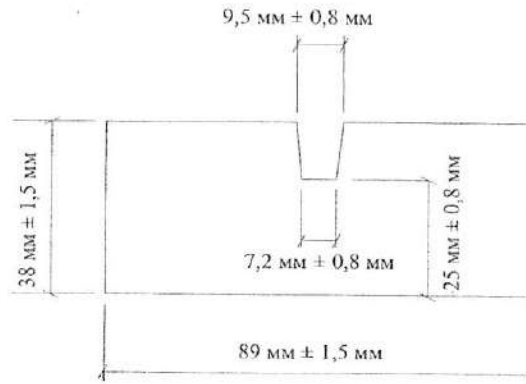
Detail of Sk-beam connection (89x38); dimensions in mm
